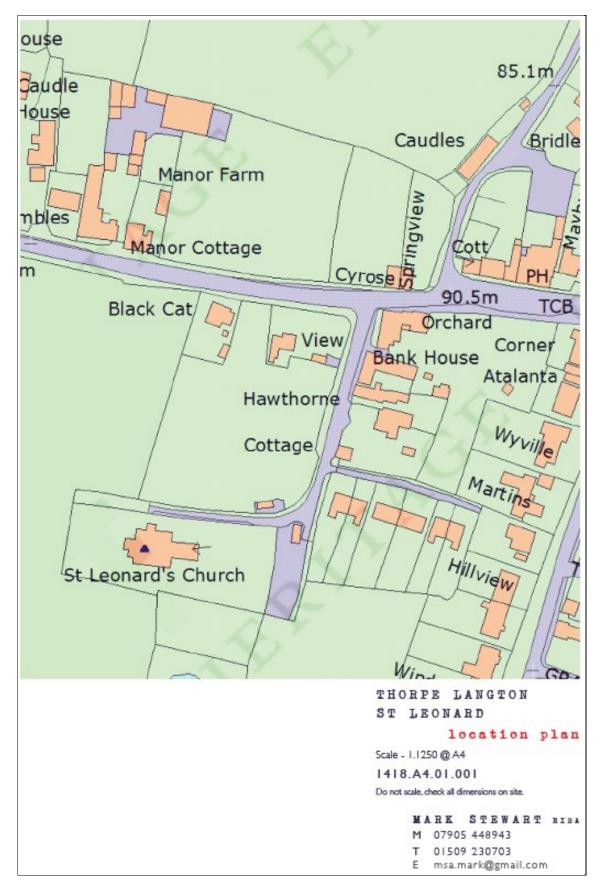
Site location plan, Church of St Leonard lower left. Plan supplied by Mark Stewart.
